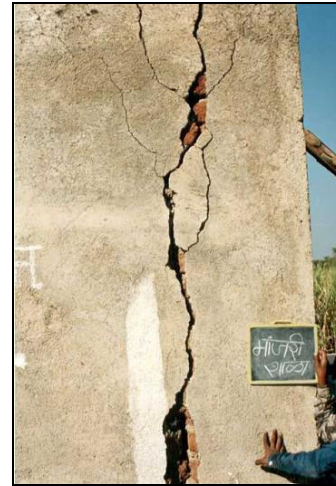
Earthquake Damage - Wall Corner cracking (1993 Killari earthquake) (EERI, World Encyclopedia report, India, 6-5-2002)
